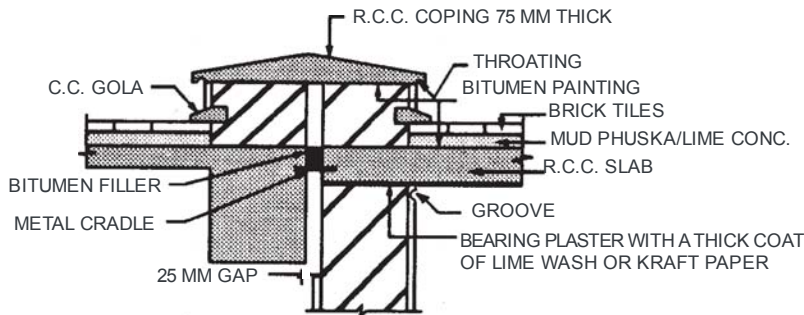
Typical Details of Expansion Joint at Wall & Beam Junction
